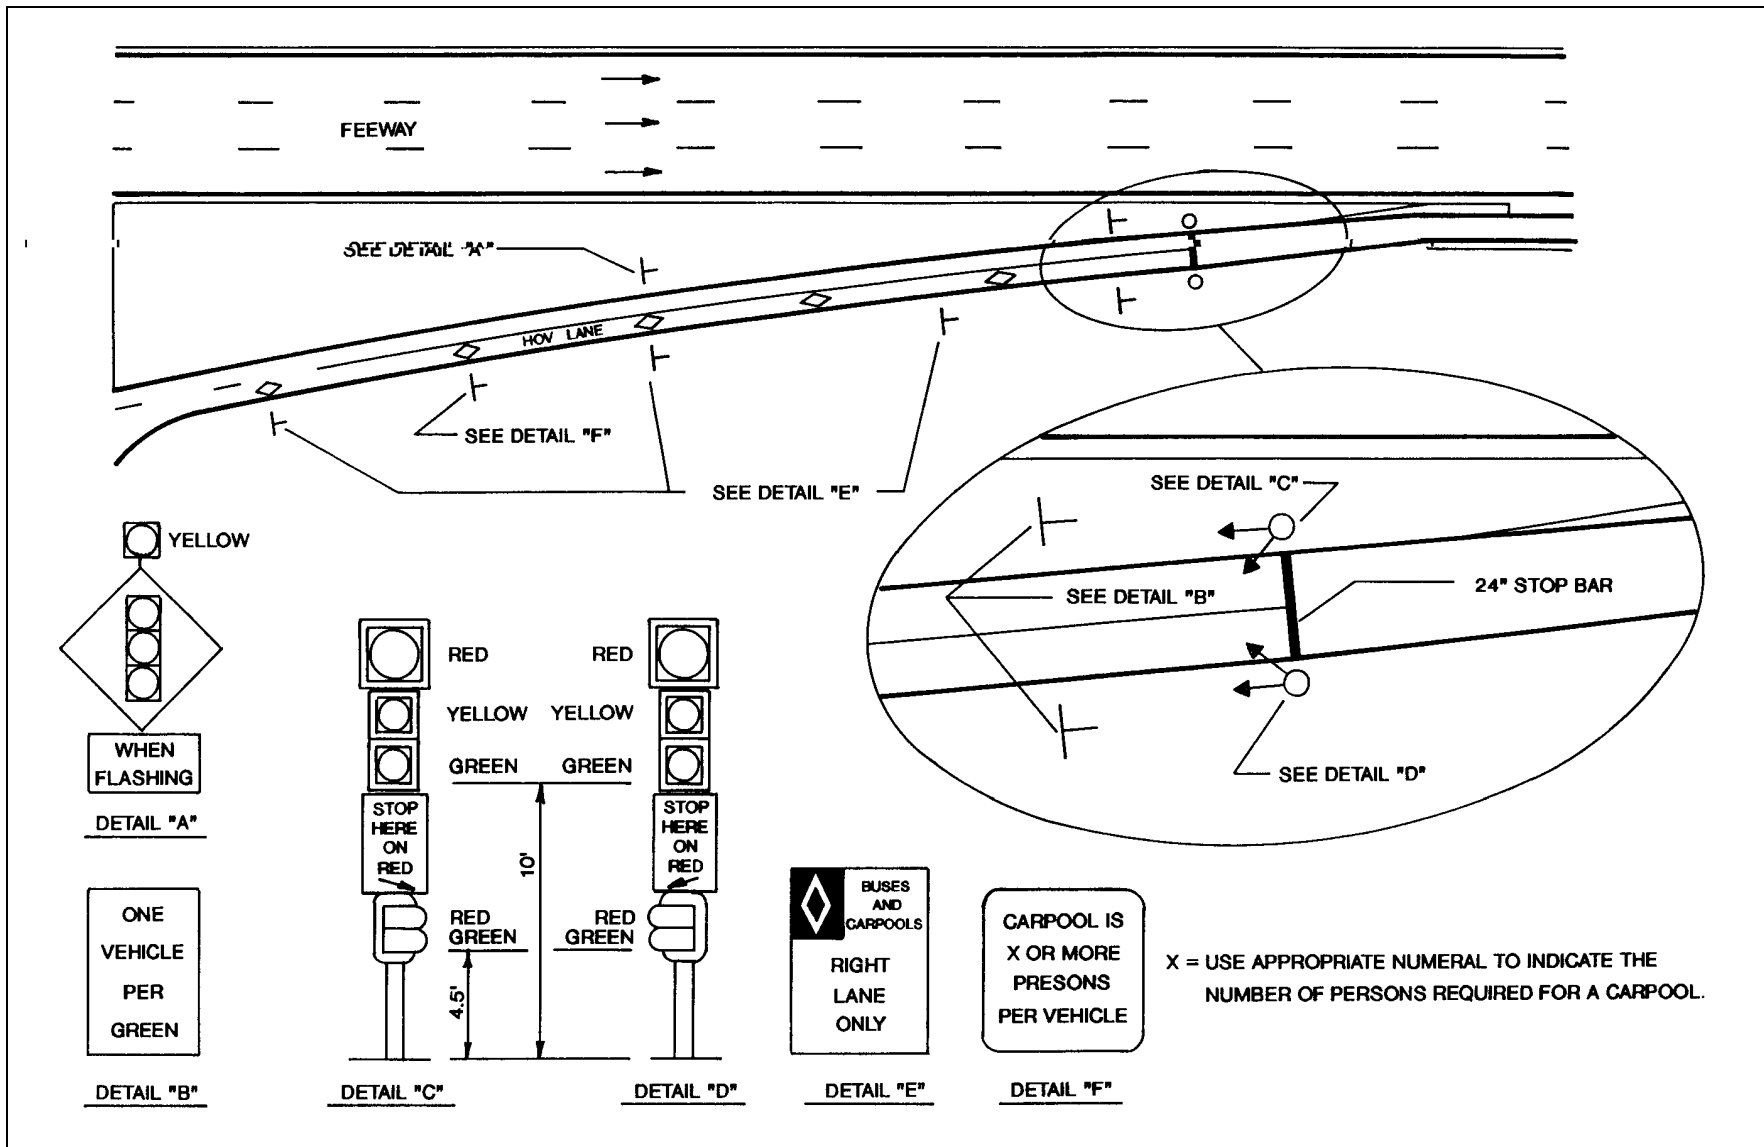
Typical ramp meter and HOV bypass lane installation.
